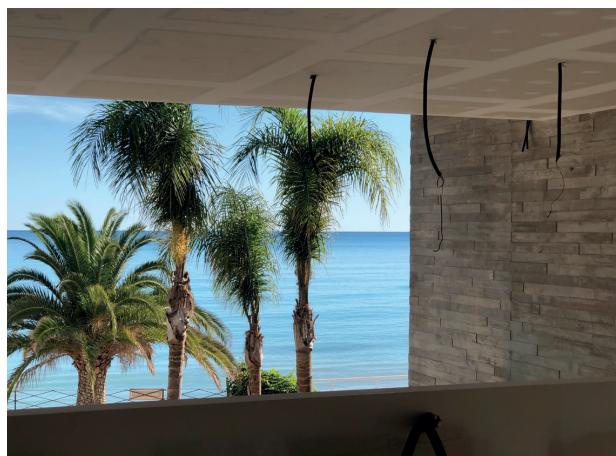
Details of NW and SW façade gaps. 2019. sanahuja&partners. 2019. ©Pablo Morán / Figura 7. Detalles de huecos en fachadas NO y SO. sanahuja&partners. 2019. ©Pablo Morán.
